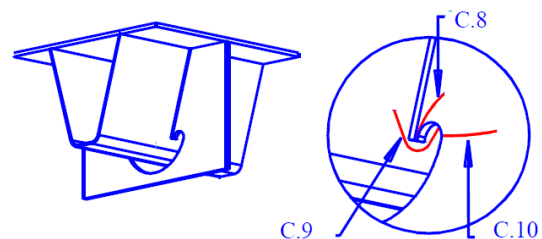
Crack in the rib-crossbeam connection with cope hole [4]
